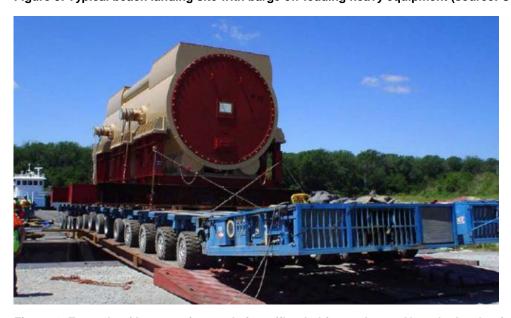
Example of large equipment being offloaded from a barge. Note the levels of the ramp, the barge and the jetty (source: SUBTECH)
